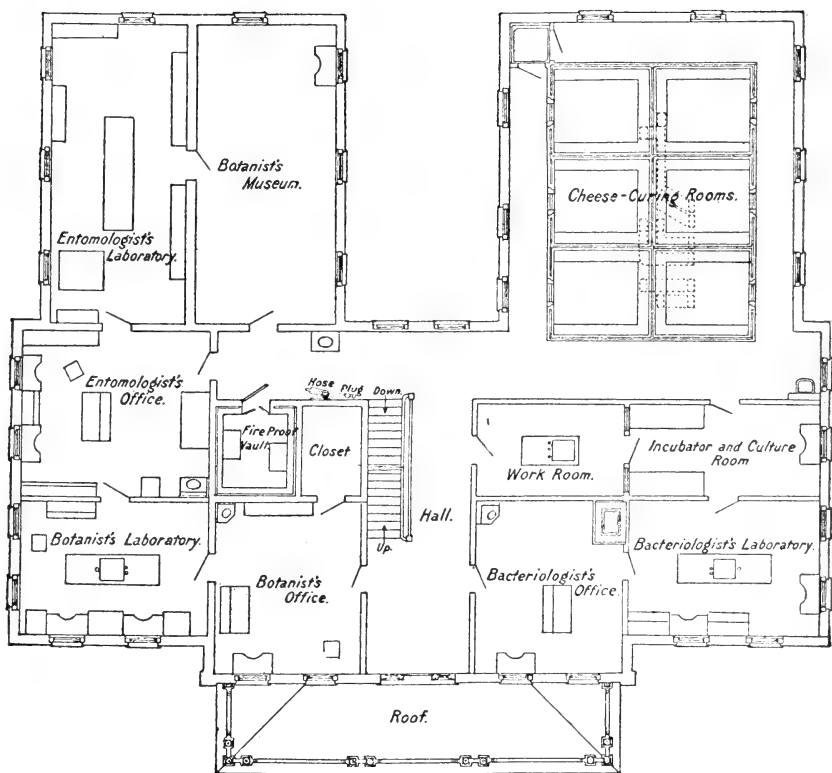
SECOND FLOOR PLAN OF BIOLOGICAL AND DAIRY BUILDING.
